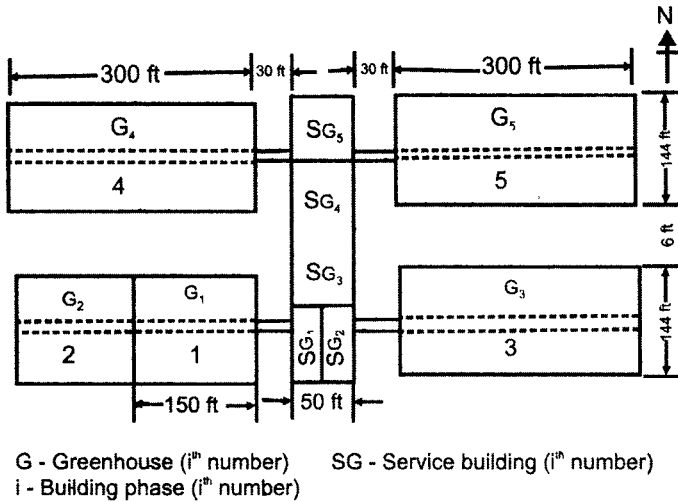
Floor plan for a greenhouse firm showing construction in phases.
